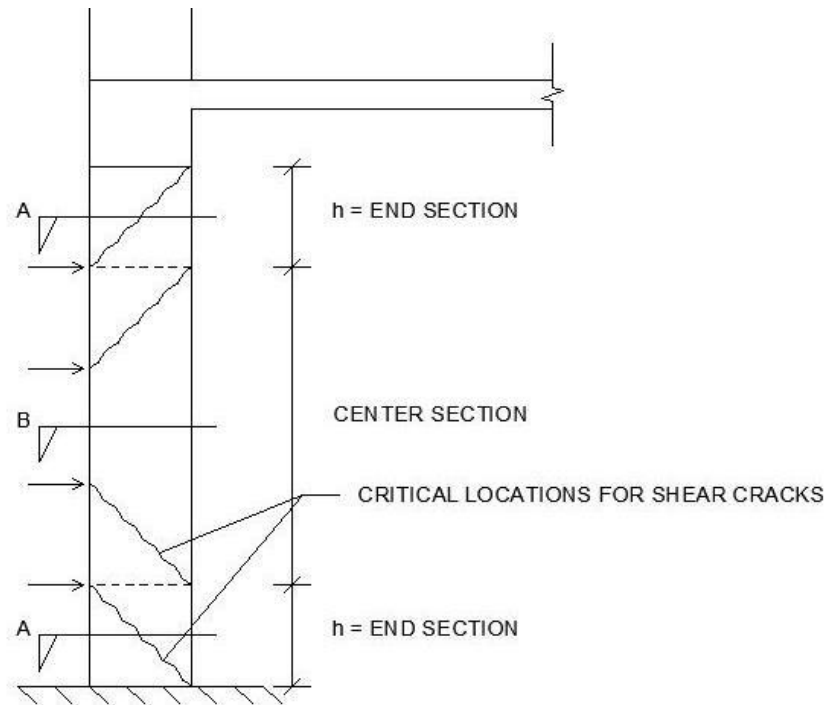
Critical impact load locations for shear force in an exterior MRF column.
